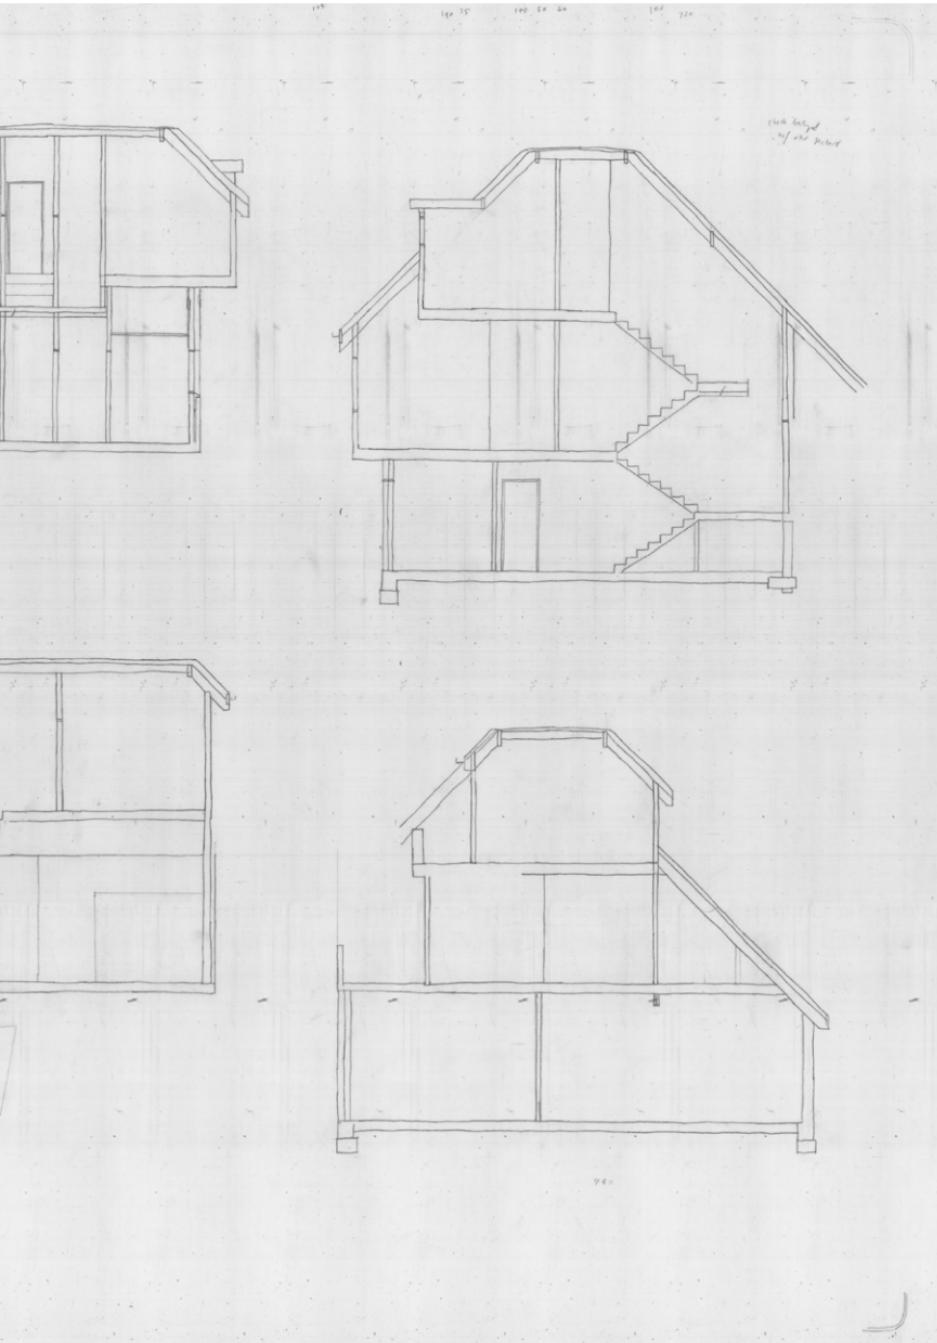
My second redrawing of the sections, altering them to match the house as it exists
